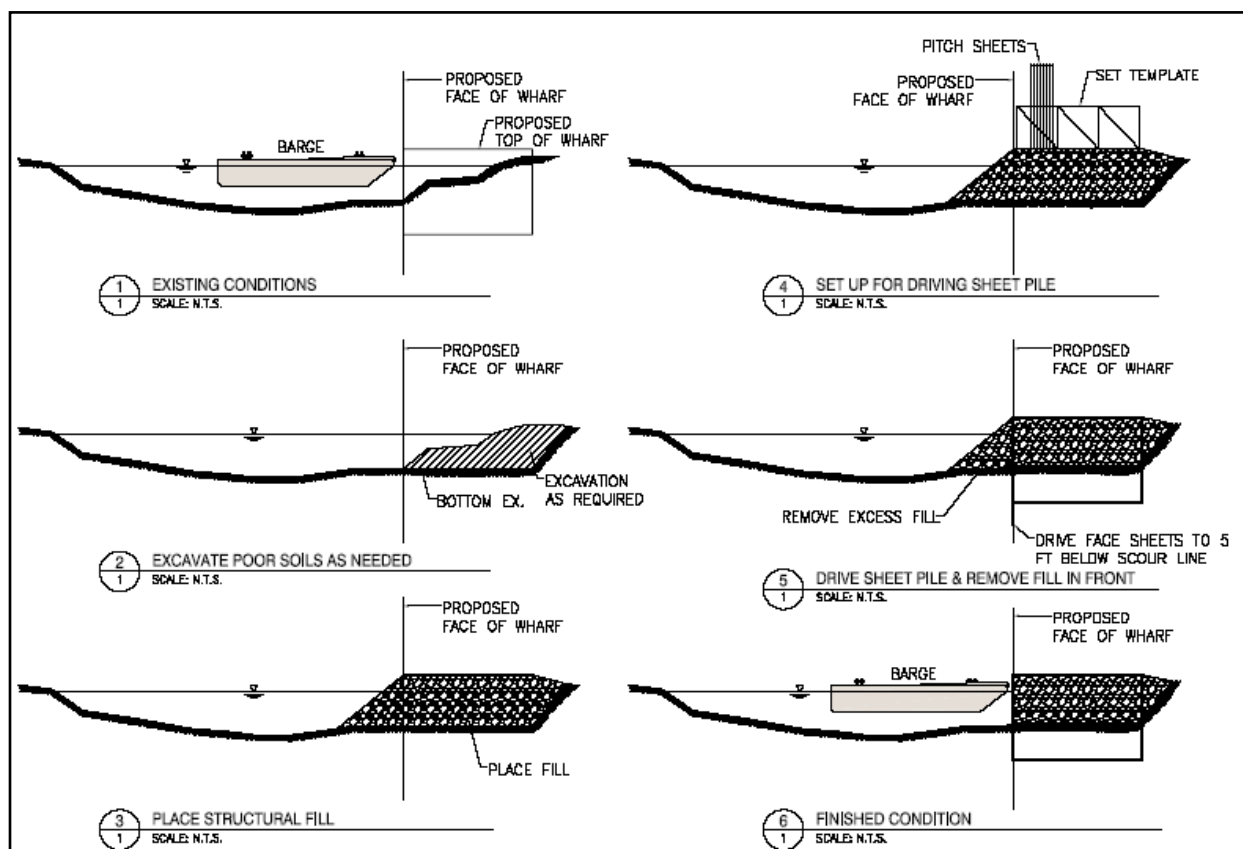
Example of Possible Sheet Pile Wharf Construction Sequence.
